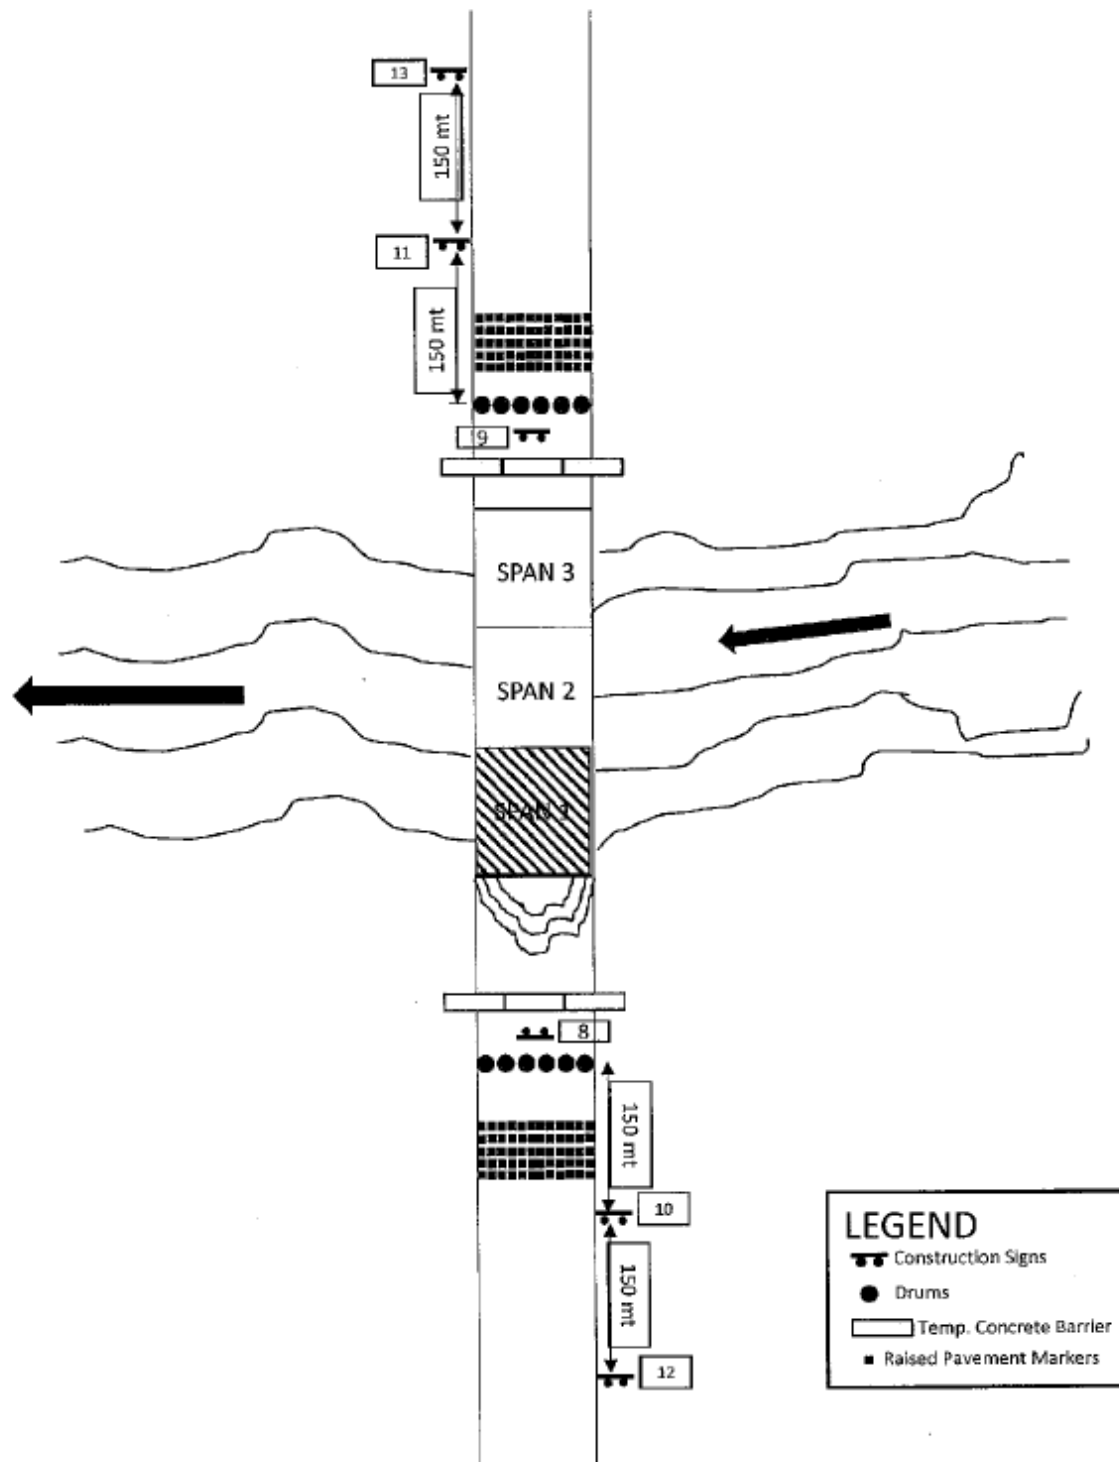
Diagram from October 9, 2017 report indicating collapsed span of Bridge 769 (source: FHWA)
